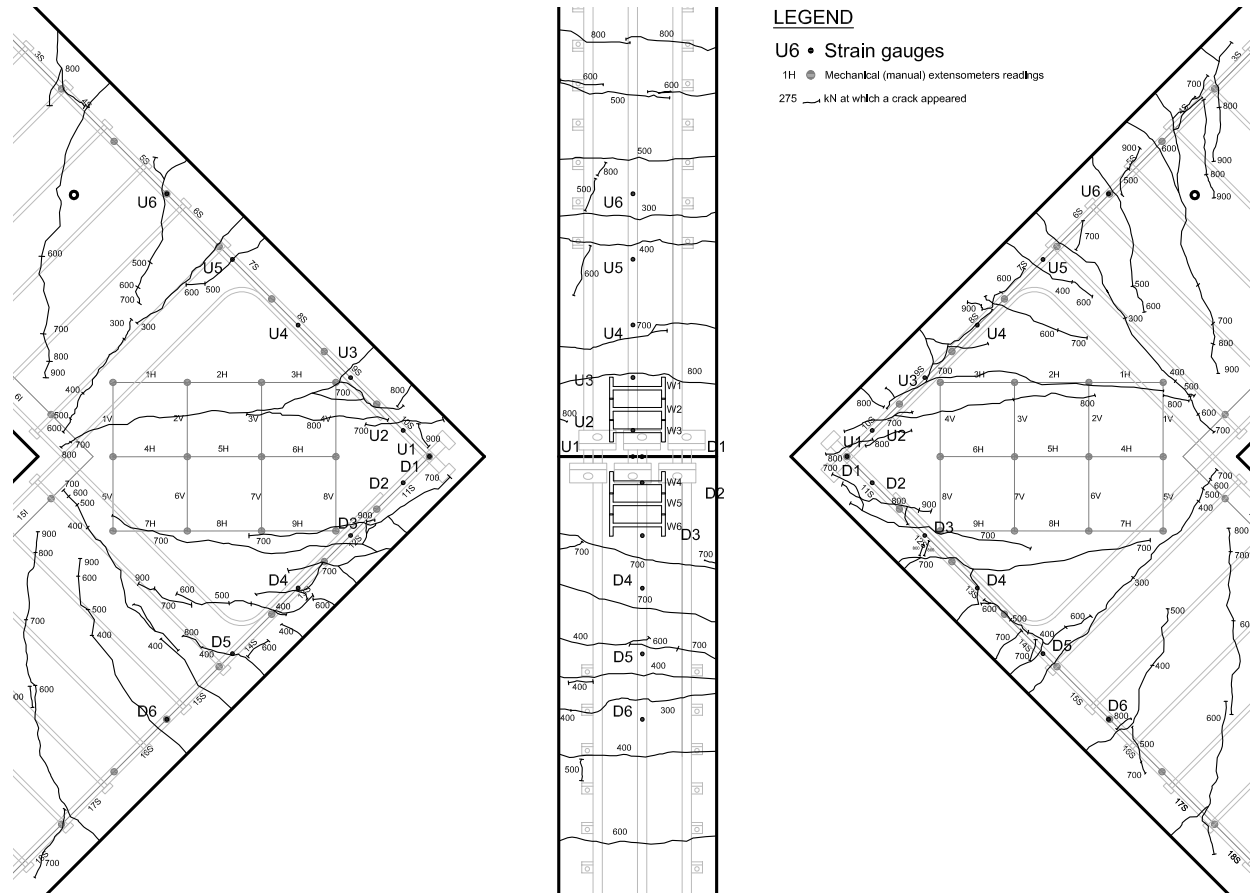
45-TH-25. Crack pattern. From left to right: front view (A), side view, front view (B)
